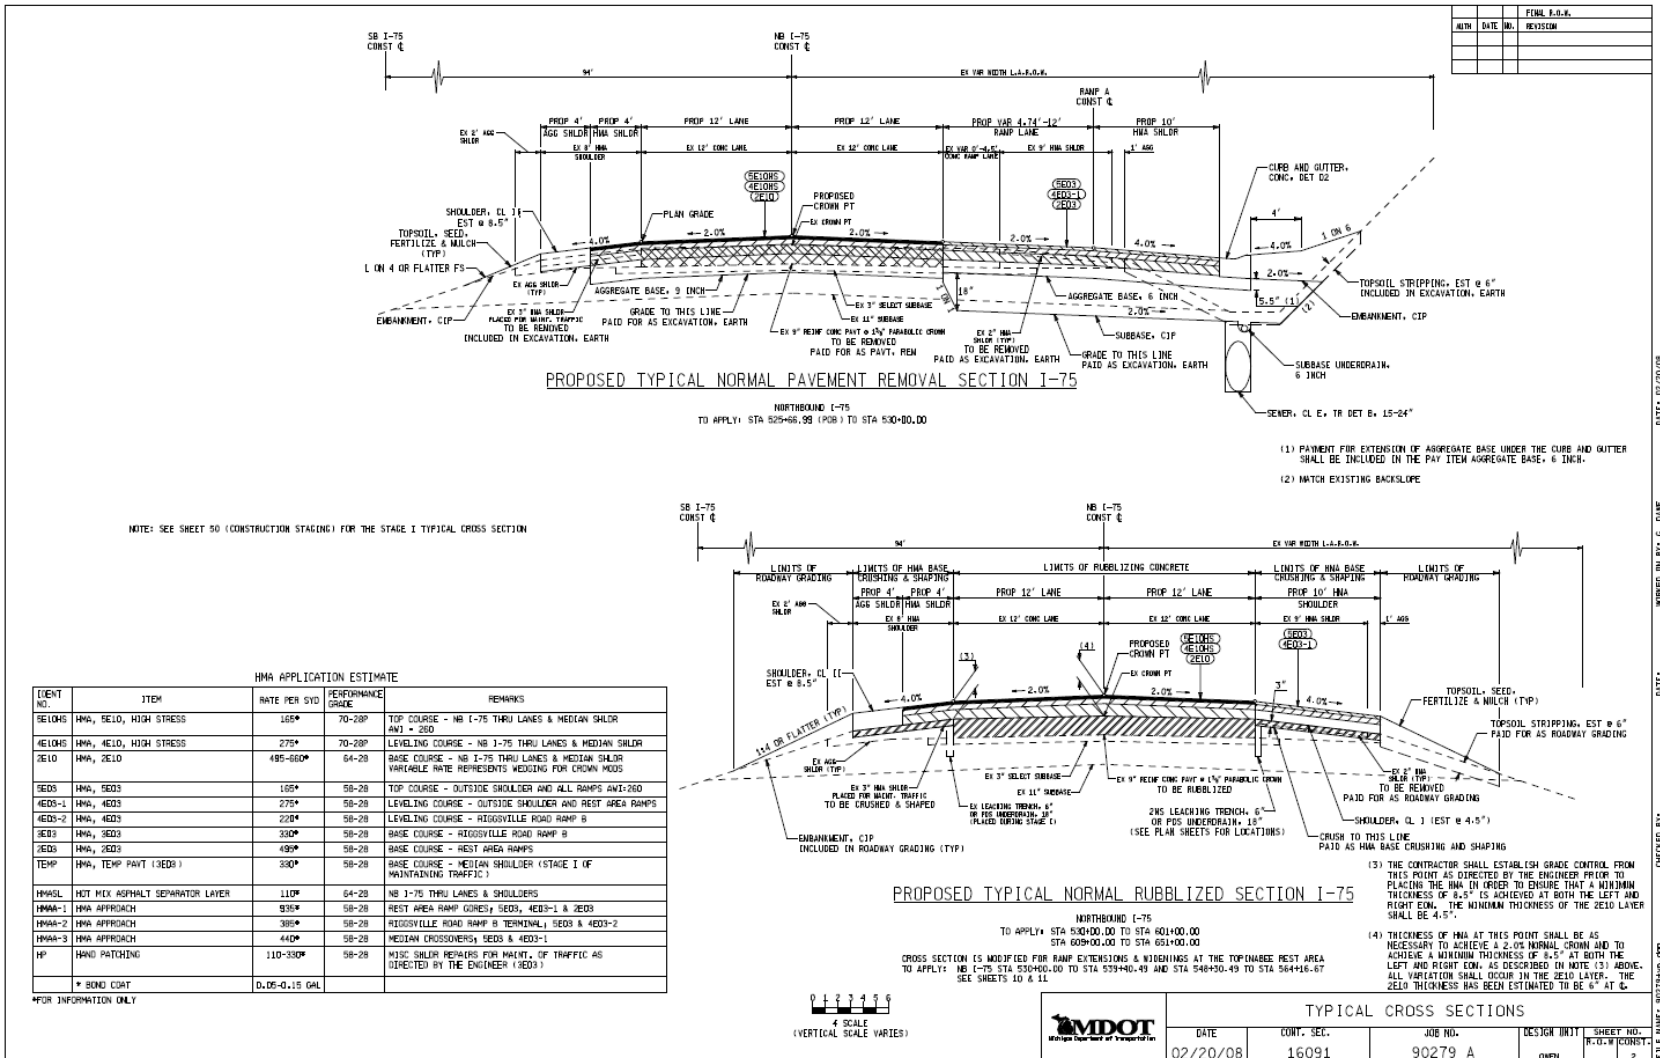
JN 90279 Typical Cross-Section for I-75 NB perpetual over rubblized concrete project: (upper one: pavement removal section, Sta 525+66.99 to 530+00; Lower one: rubblized section, Sta 530+00 to 601+00, and Sta 609+00 to 651+00)
